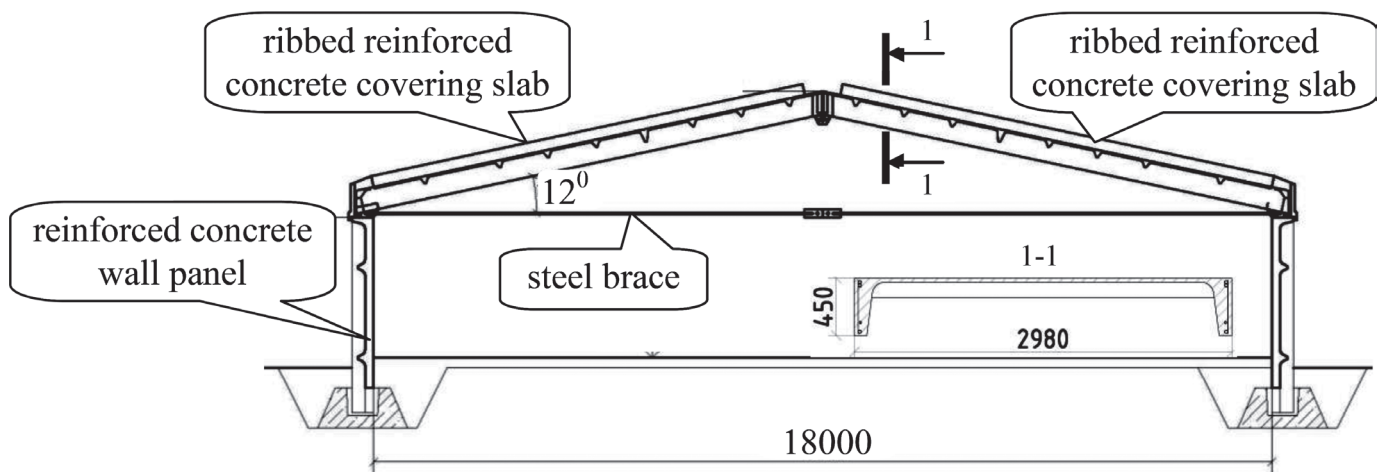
General view of the covering panel of the prefabricated reinforced concrete
